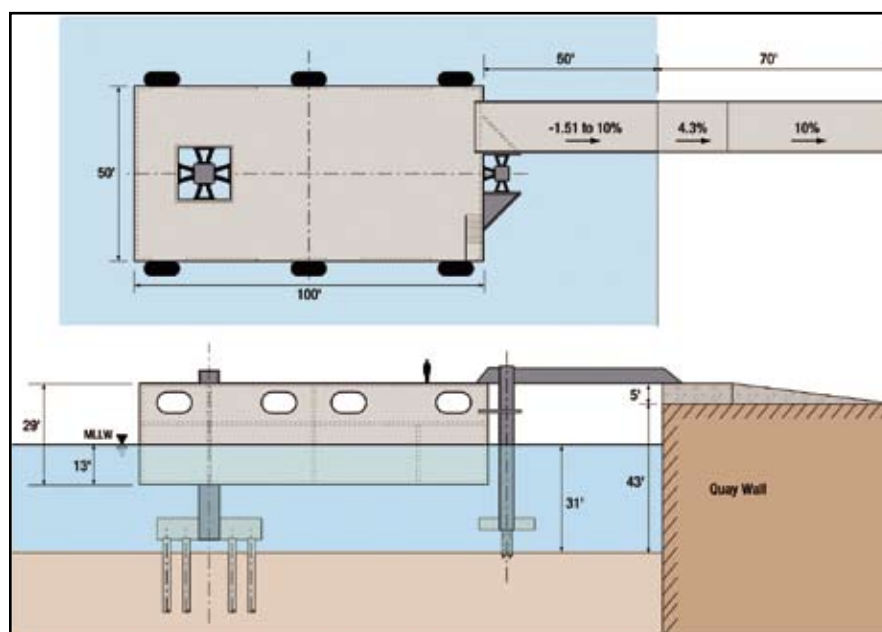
Plan and section isometric views of the test bed illustrate the general dimensions and orientation of the MHP to dockside and the steel mooring shaft.
